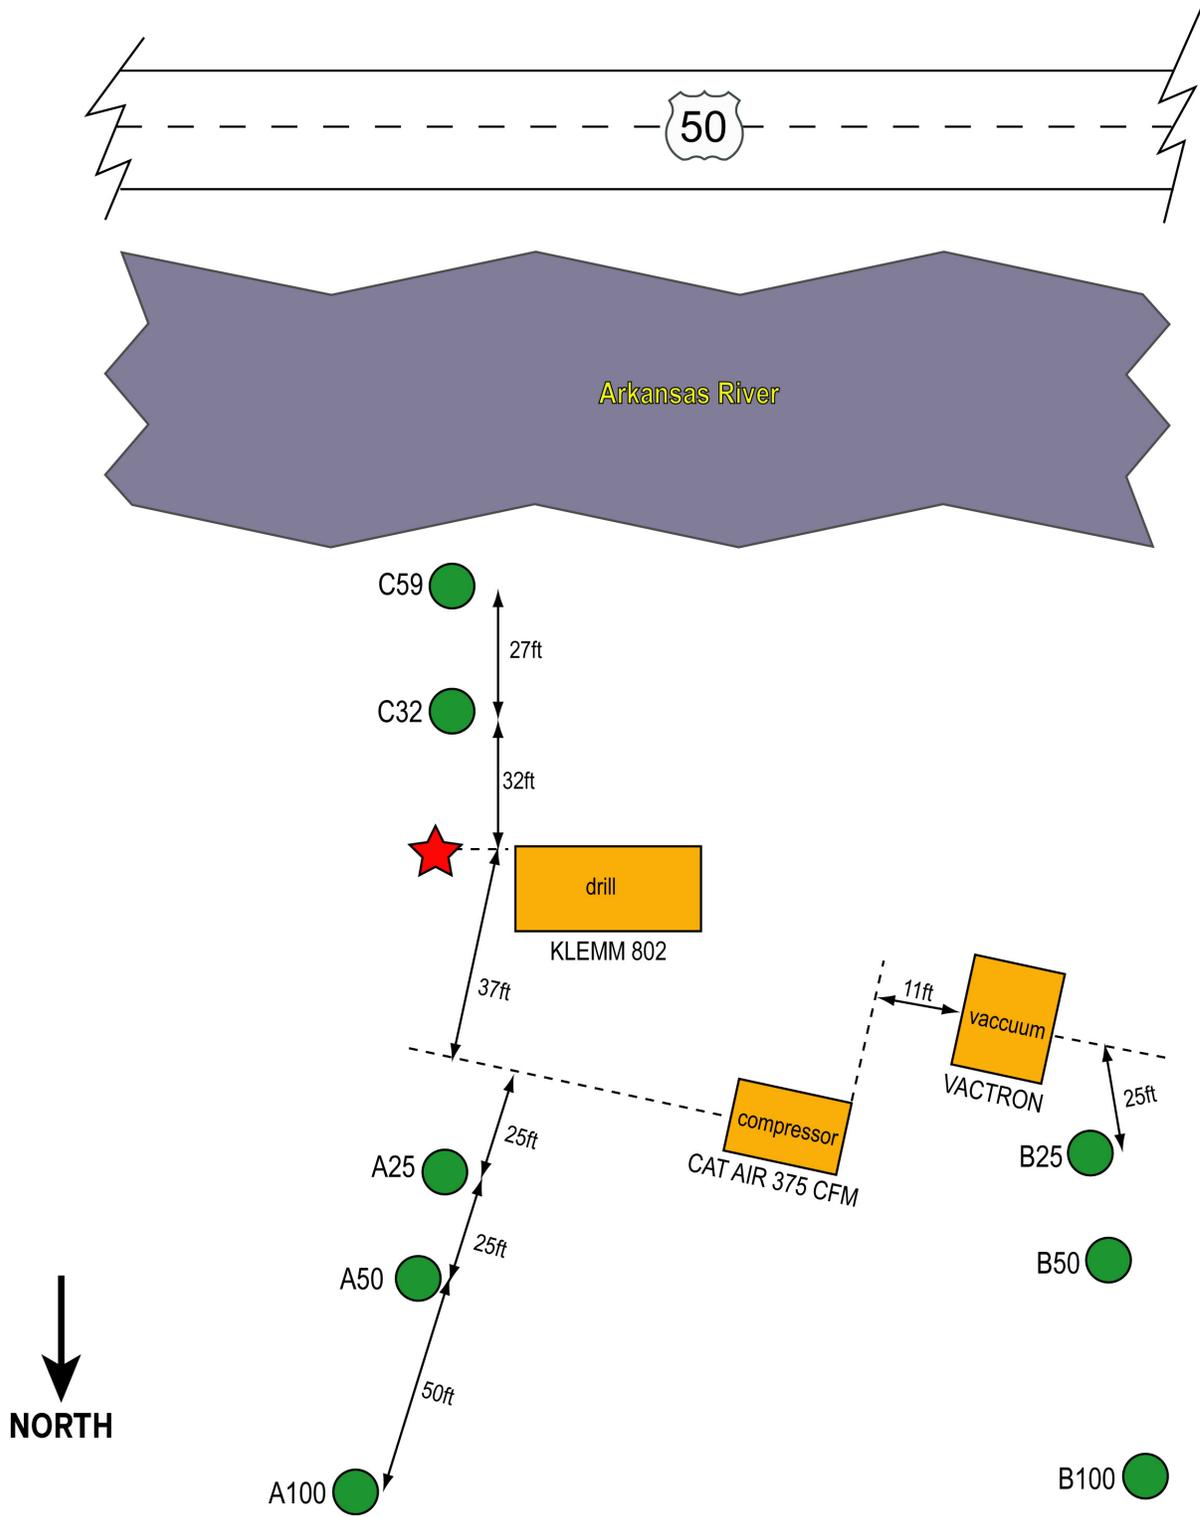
Layout of Noise Measurements for KLEMM KR802 Drilling Vertically
